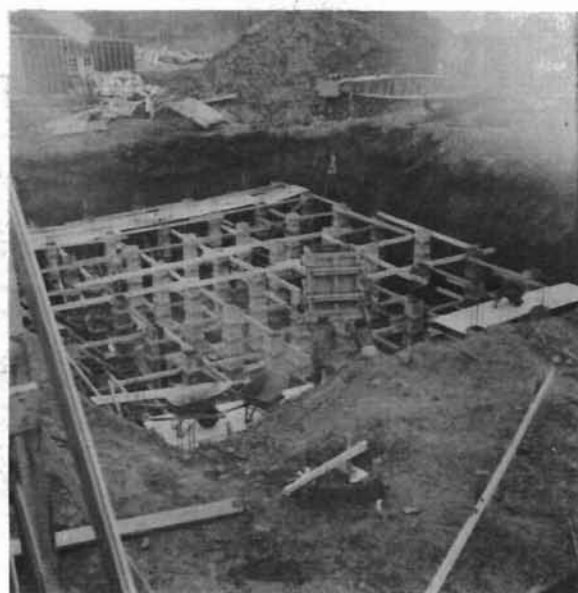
Pouring first lift of boiler room piers. Note crane holding concrete hopper. August 30, 1957.
